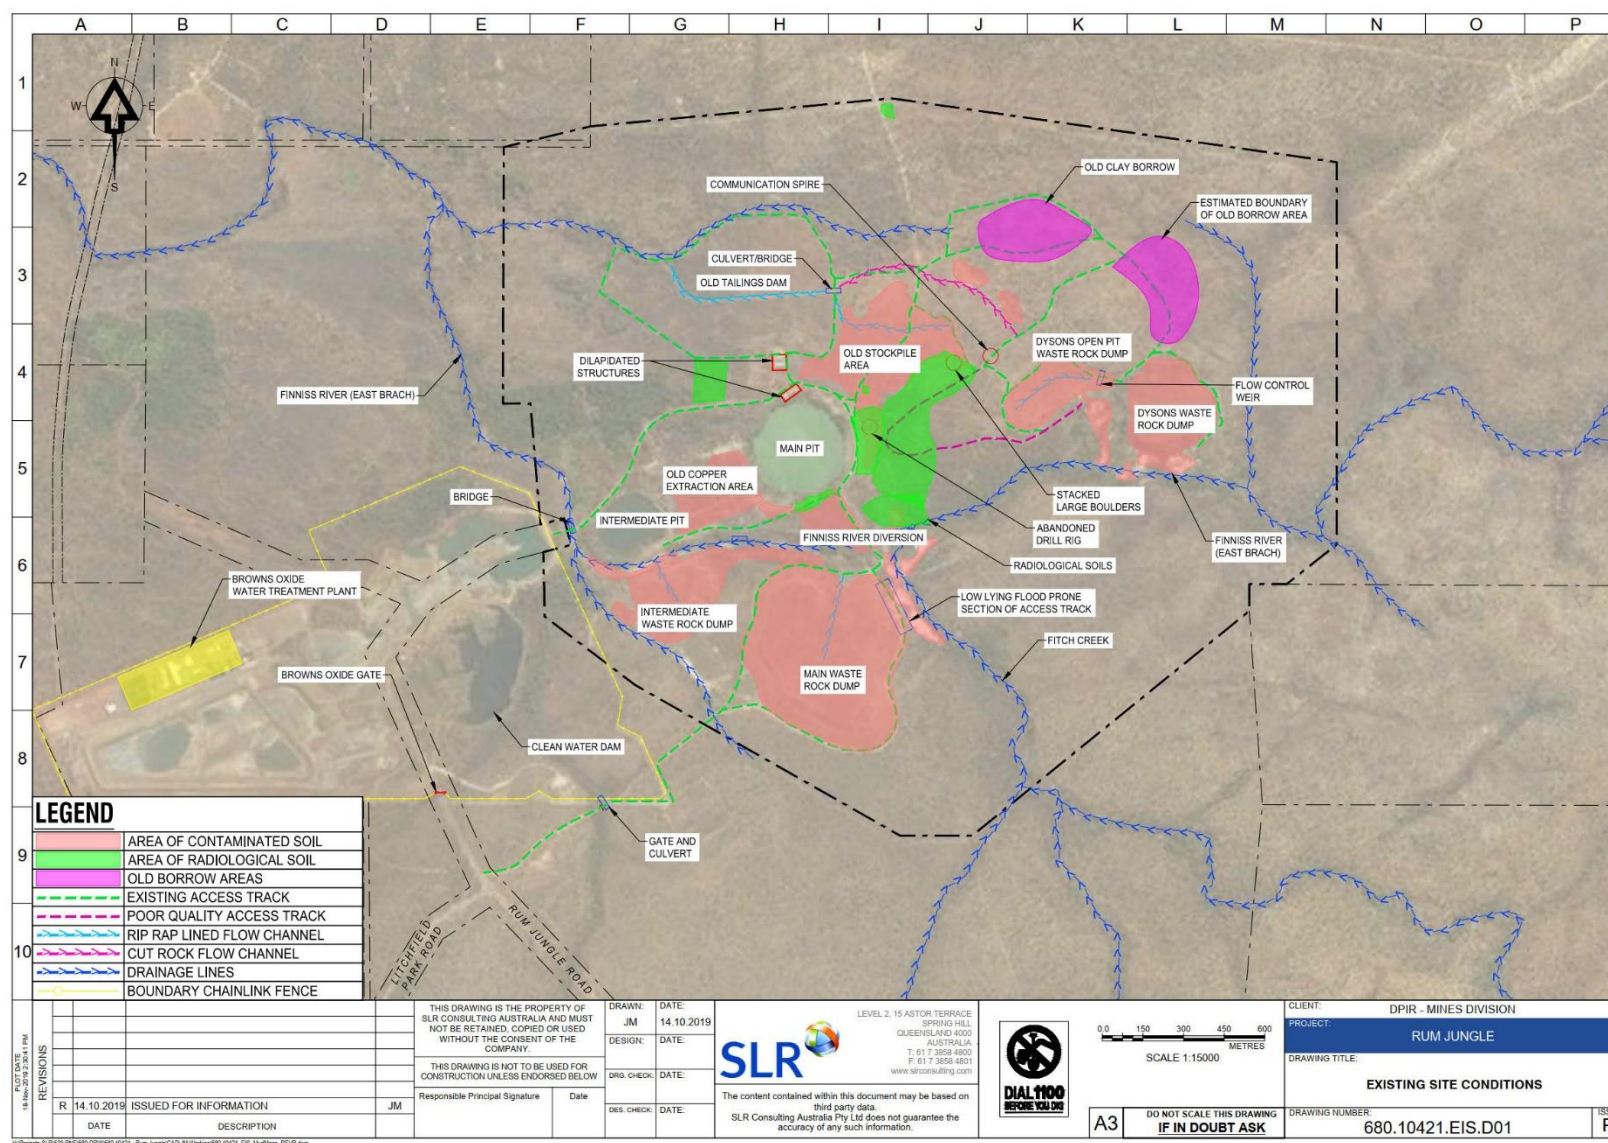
Existing site conditions at the former Rum Jungle Mine site
